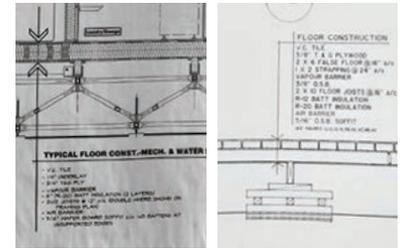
Single Insulated Floor (left) False Framed on Structural Floor (right)
